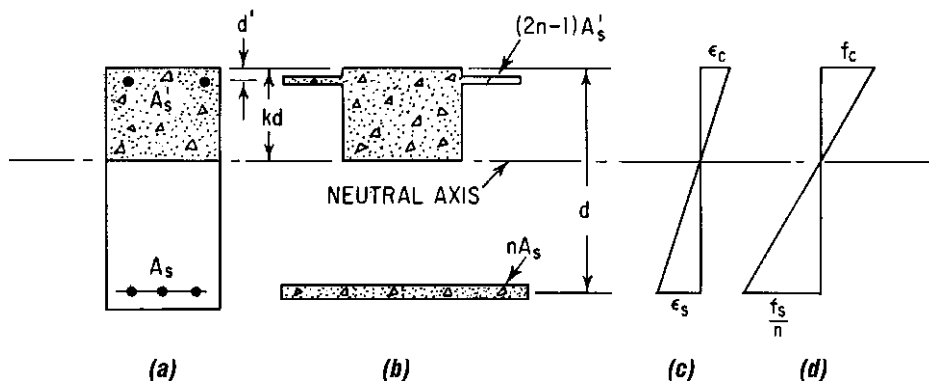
Typical cracked cross section of a reinforced concrete beam: (a) Only the reinforcing steel is effective in tension. (b) Section treated as an all-concrete transformed section. In working-stress design, linear distribution is assumed for (c) strains and (d) stresses.
